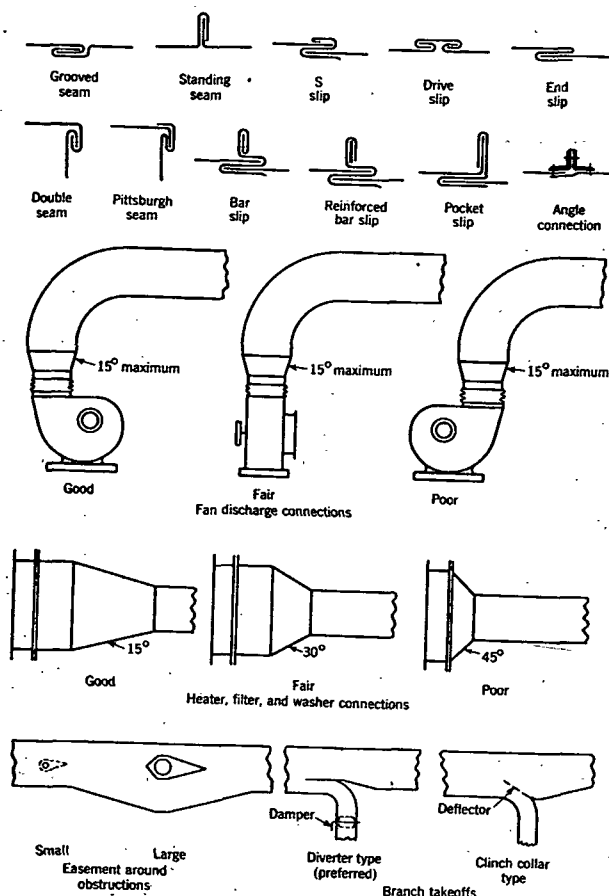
SHEET METAL DUCT AND ARRANGEMENT DETAILS
